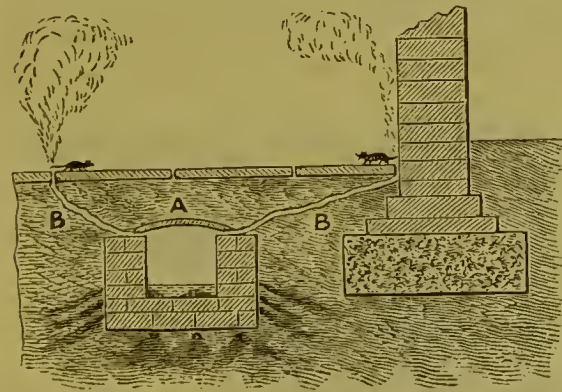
Rat-runs from Defective Drain into Basement, Foul Air escaping into House.
